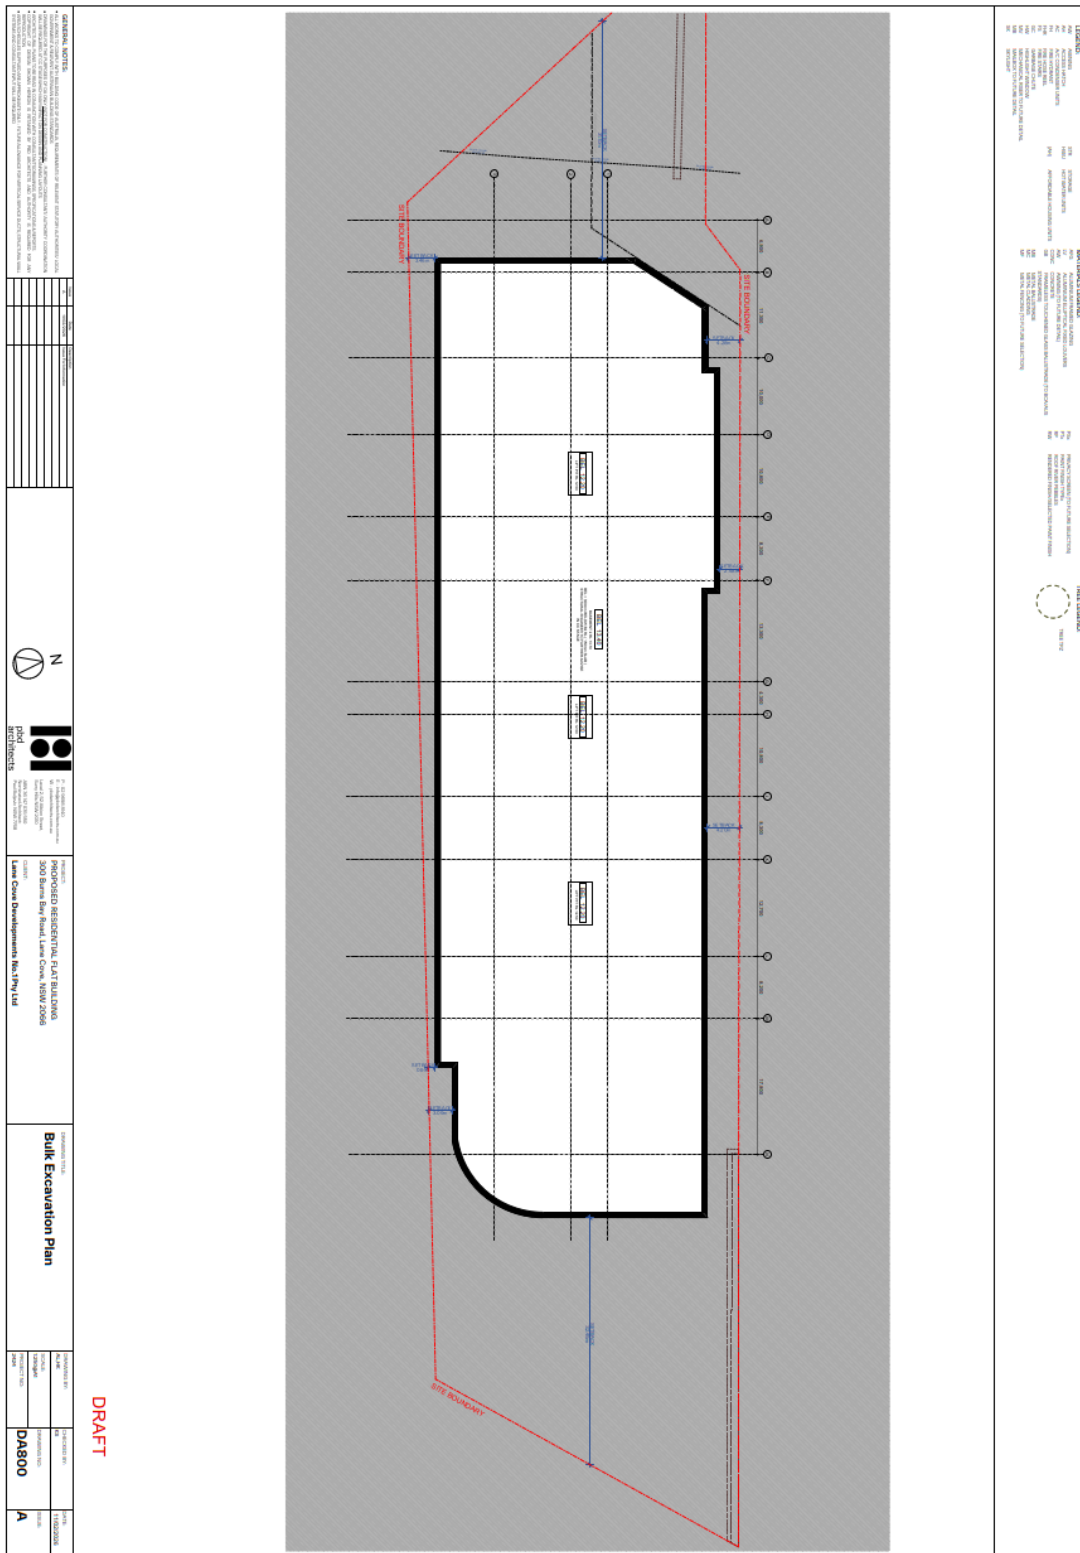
Architectural Plan – Bulk Excavation Plan
